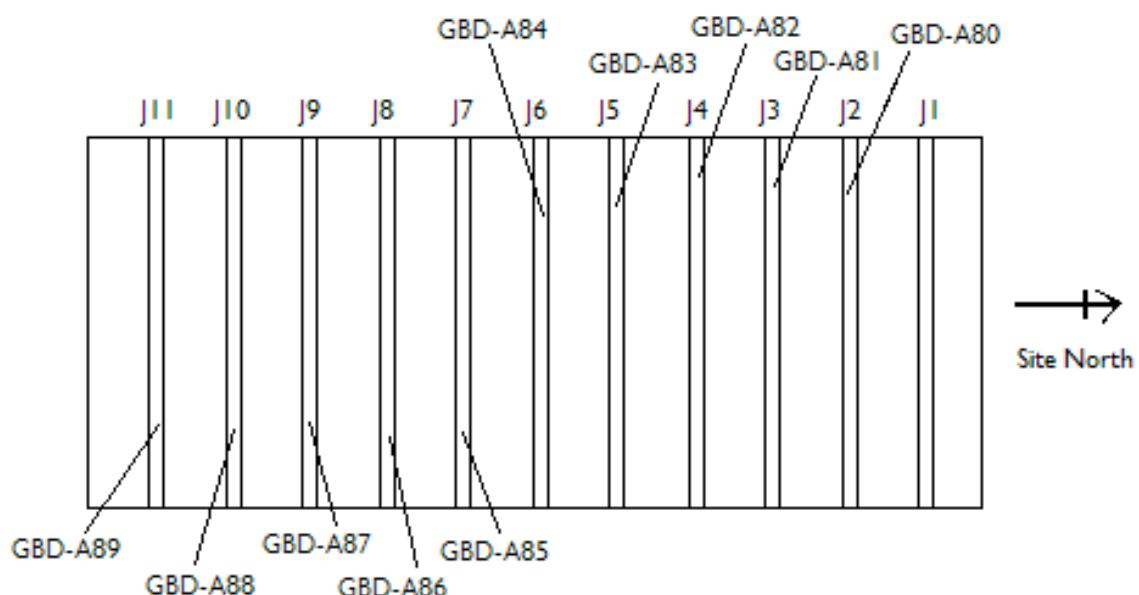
Threshing barn; sketch plan of ground floor, showing the location of samples GBD-A80–9
